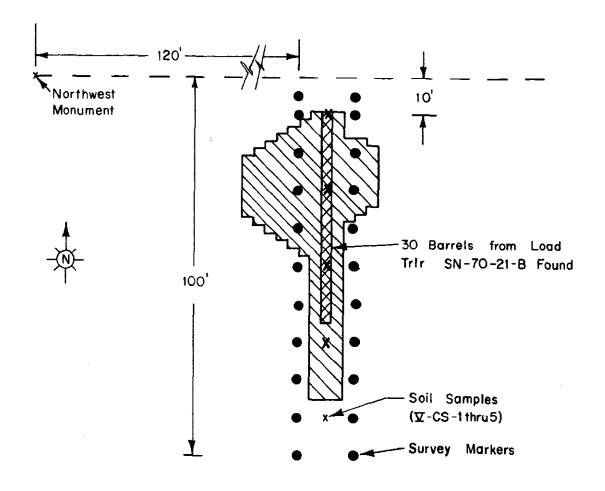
Pit 11 excavation for special Barrel No. 771-16500.
